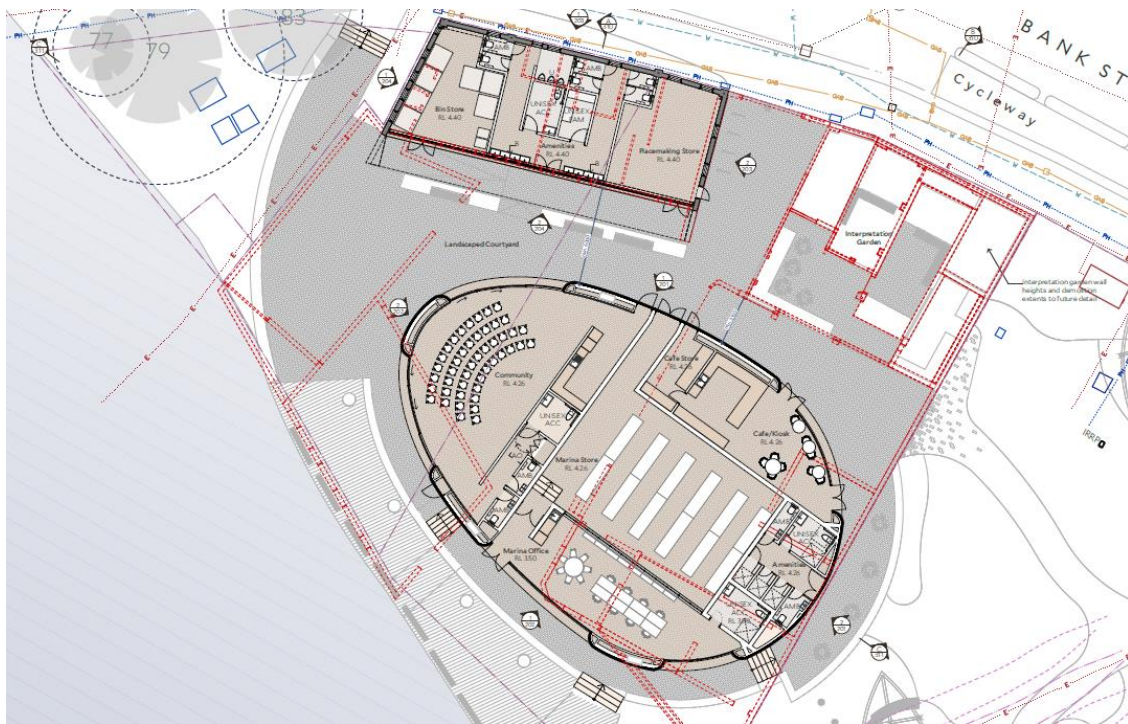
Detail of the proposed plan for works to 1–3 Bank Street showing the demolition of the buildings. (Source: Collins and Turner 2023)
